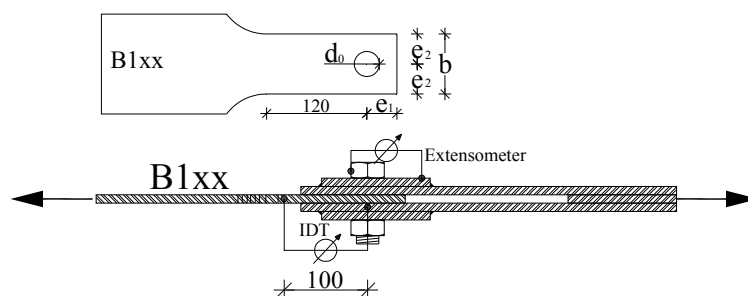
Specimen types B1 – single bolt connection with bolt in double shear
